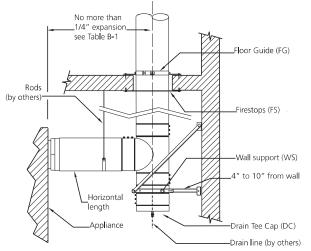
Single axis 90° Tee (T90) support from interior floor and ceiling
